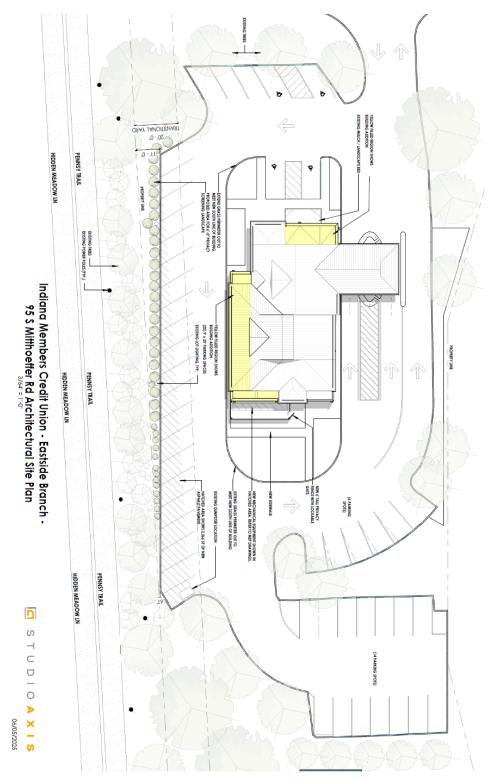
The site plan of the addition being added to the commercial building on the subject site.
